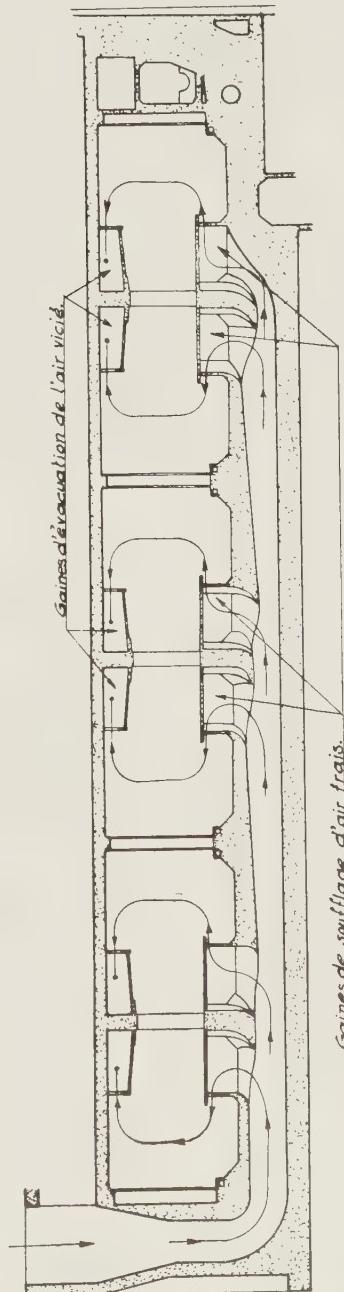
Central Halt. — Section = Transversal ventilation.
